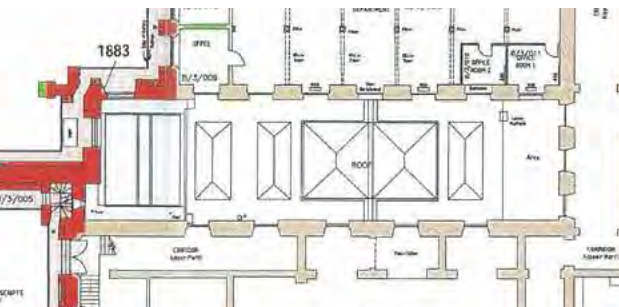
Level 03 Historical Development Plan (extract from Conservation Plan)
